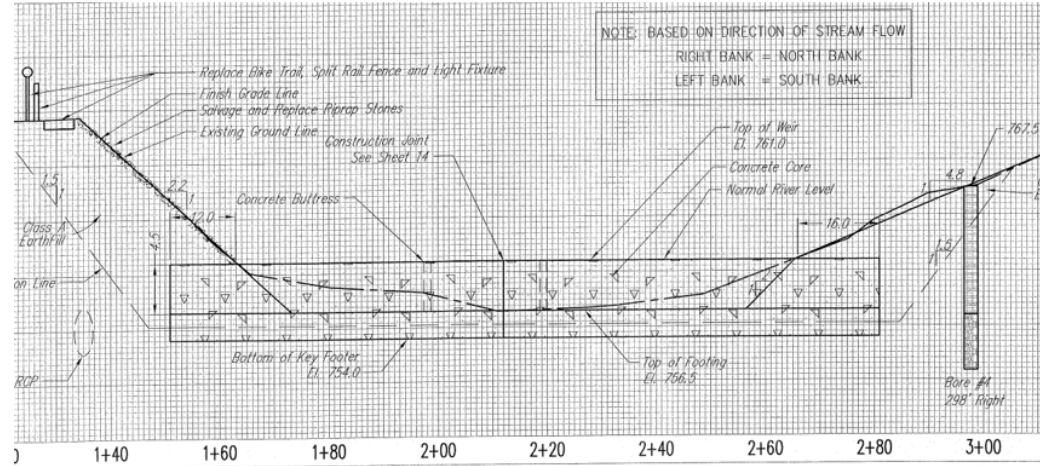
Blanchard River – Existing Inline Structure - (Section Detail)
